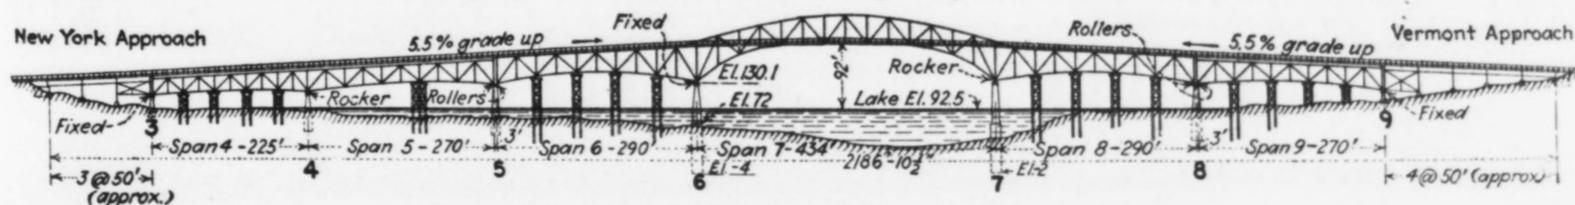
GENERAL ELEVATION, LAKE CHAMPLAIN BRIDGE
